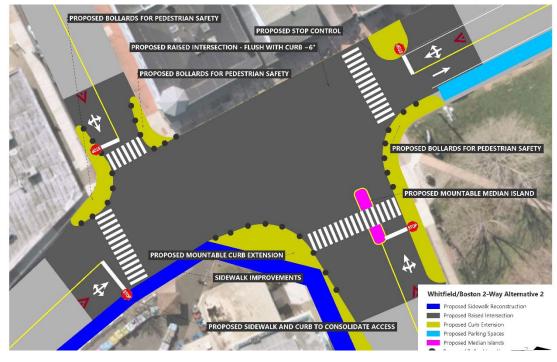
Water Street/Whitfield Street/Boston Street Two-Way Alternative 2
